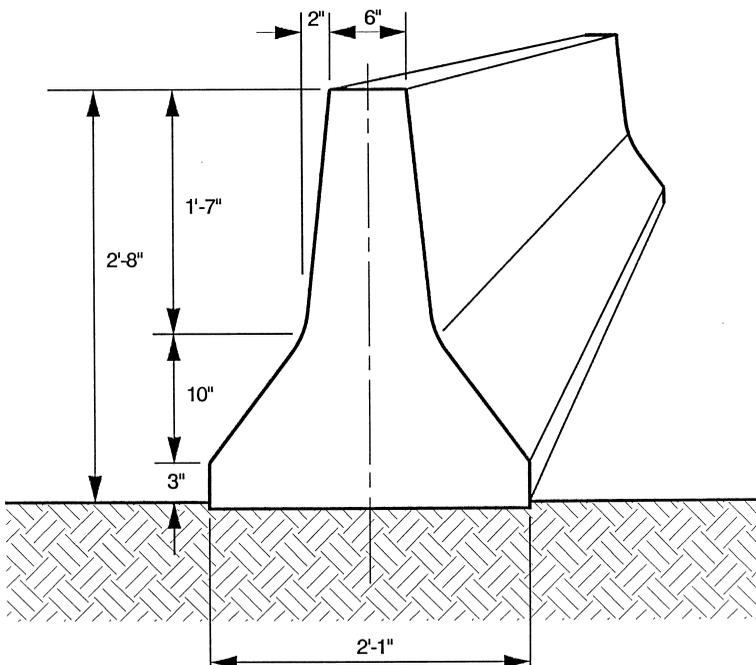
Concrete barriers provide protection for highway workers in construction zones, separate opposing traffic lanes and form bridge guardrails.
